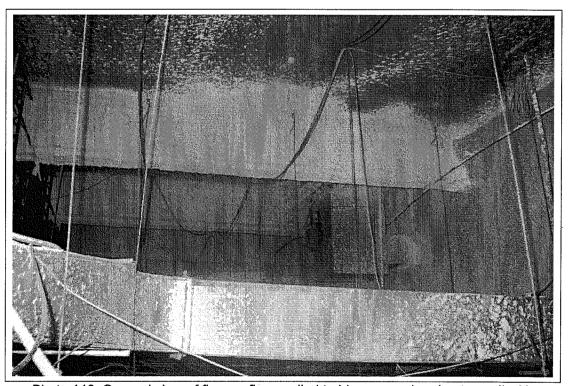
General view of fireproofing applied to I-beams and perimeter wall with overspray on ductwork above concealed spline ceiling system, East wing, 2nd floor Room L 211
